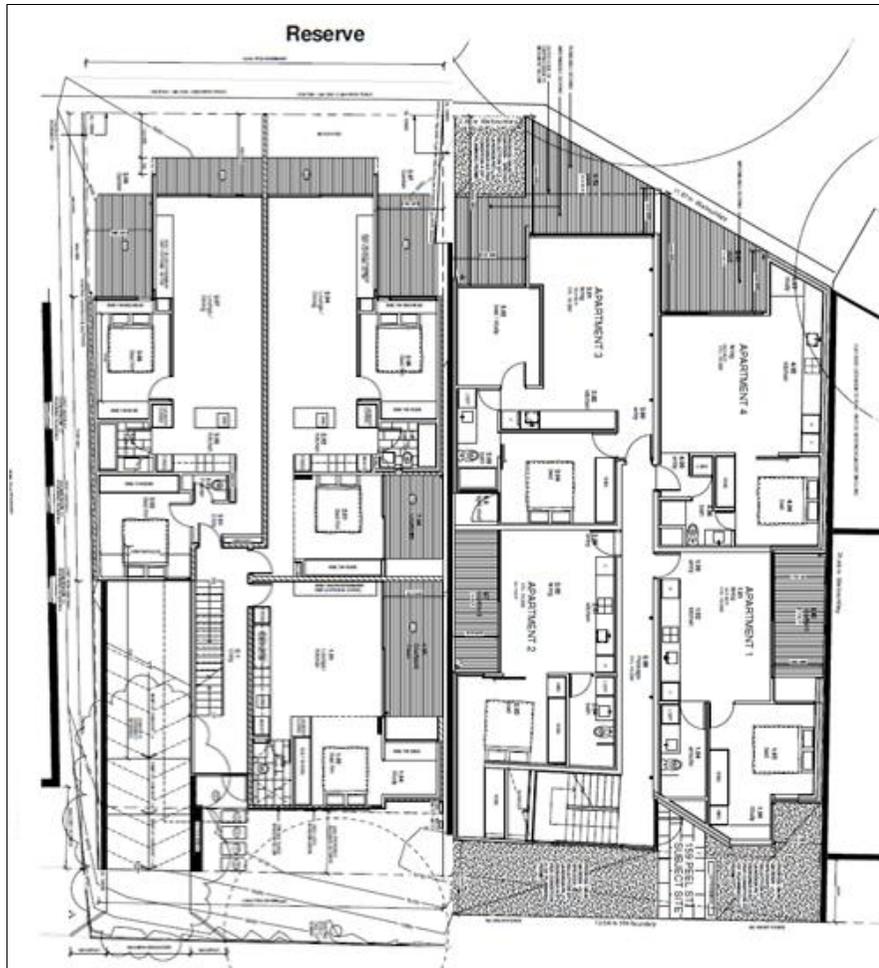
3.3 SHOWING TYPICAL APARTMENT LAYOUTS FOR EXAMPLE 2 ABOVE
